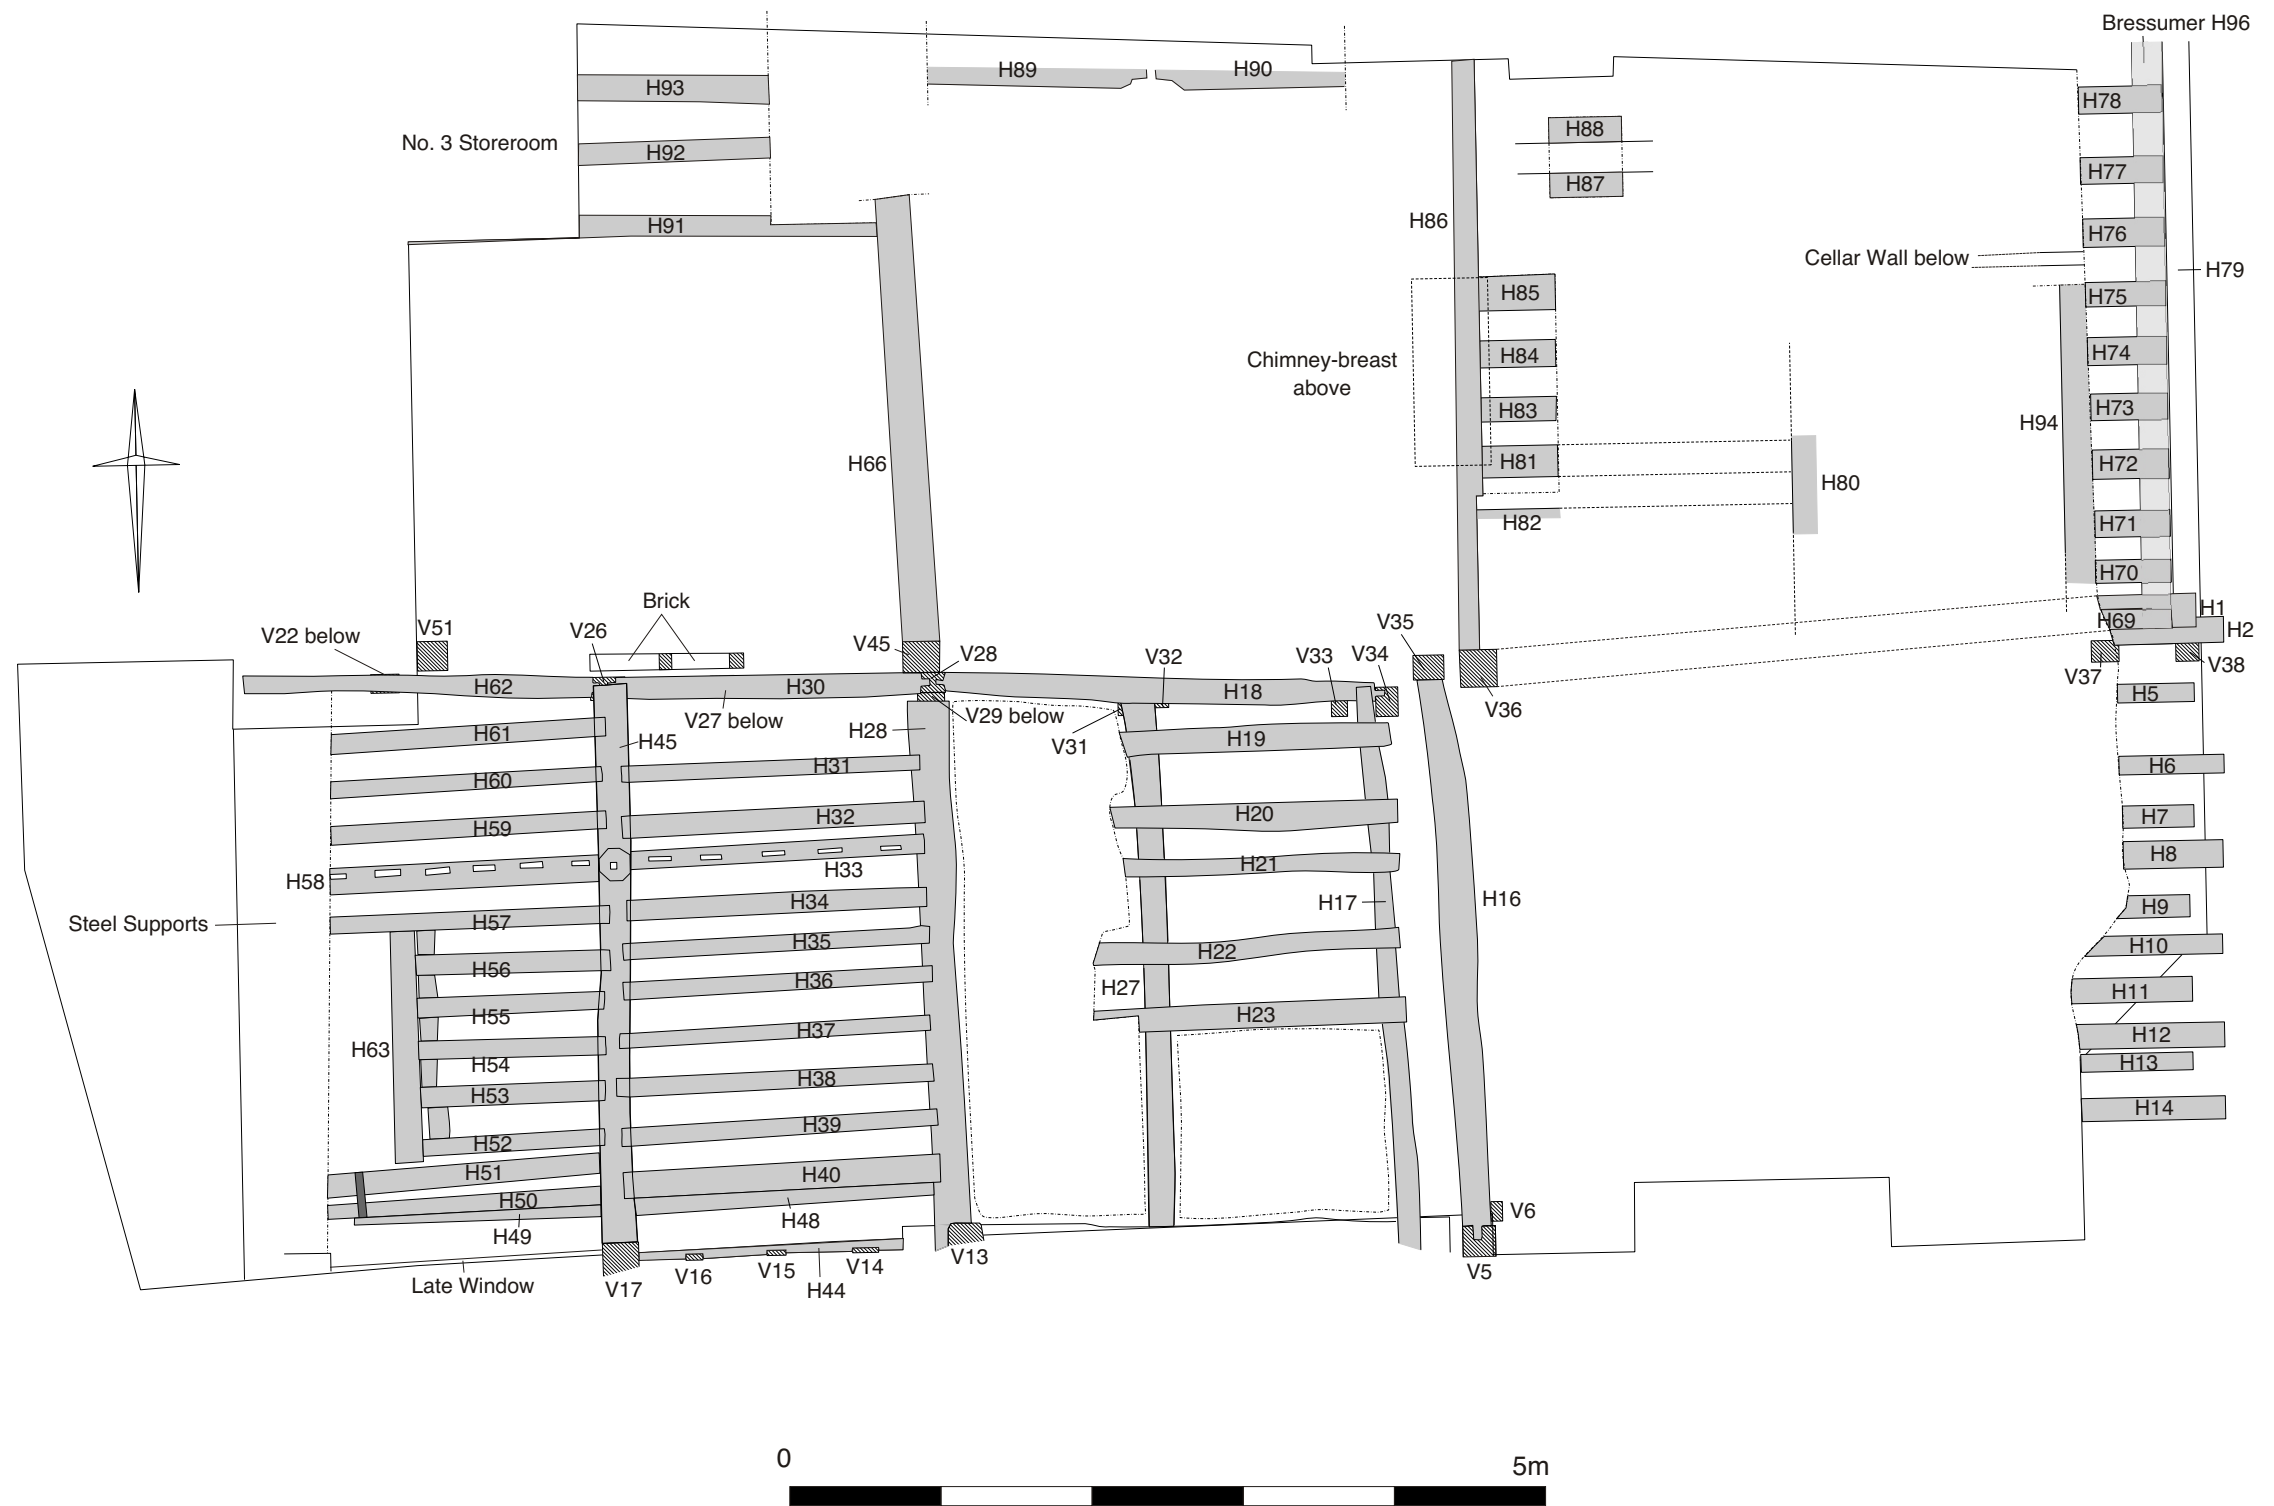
4-5 Peas Hill, Plan of ground floor ceiling and vertical timbers (scale 1:50)
